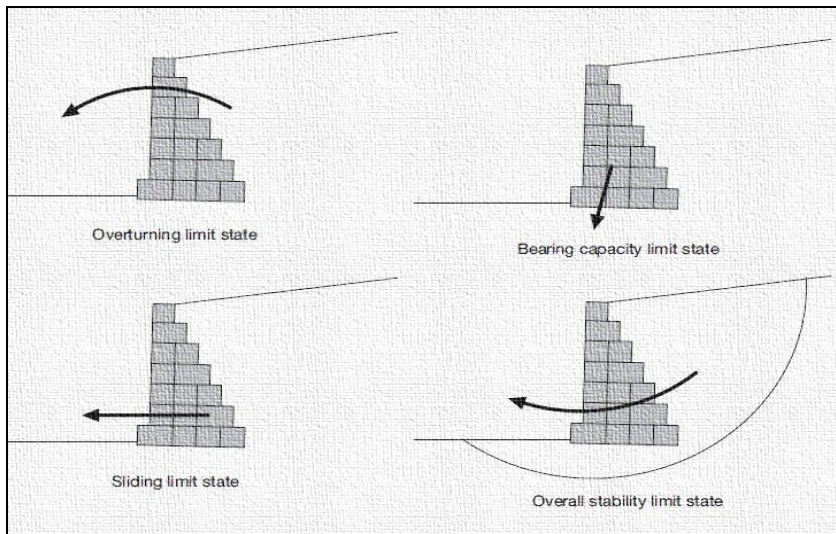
Possible schemes of destruction of the gabion gravity wall [available online]
